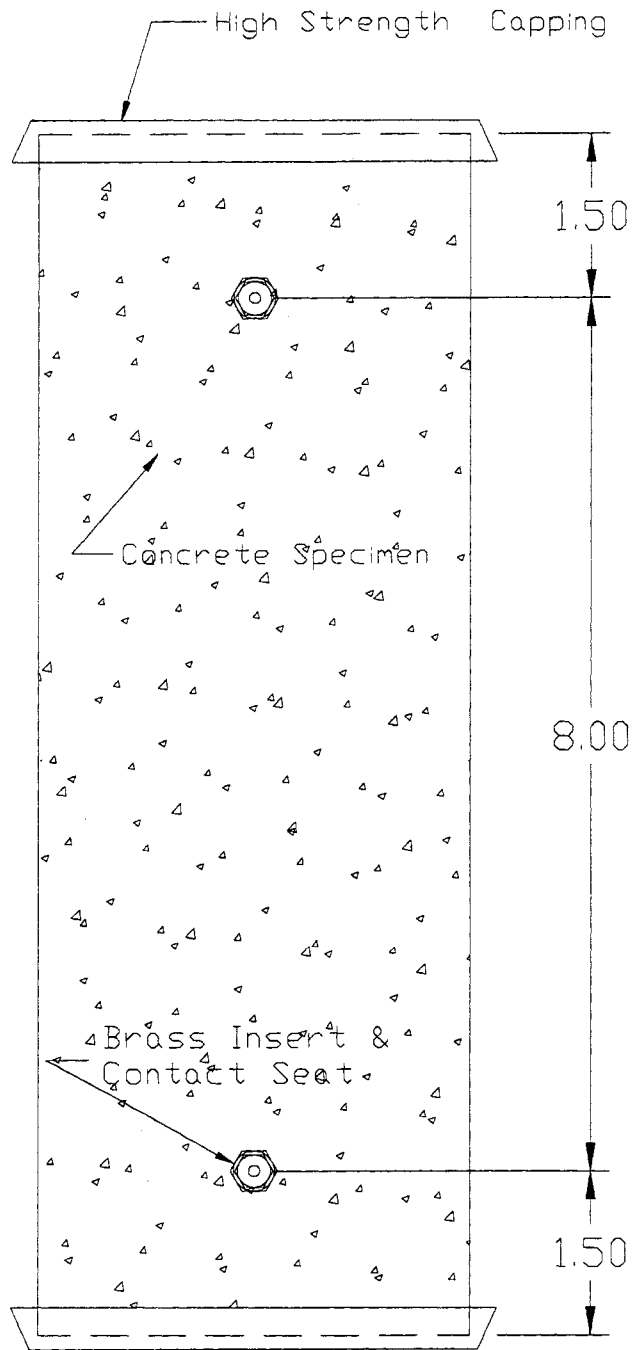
B. Side view of capped 4 x 11 in. (100 x 280 mm) creep and shrinkage specimens. Also shown are the contact seats threaded into embedded brass inserts to form 8 in. (200 mm) gage lines.
